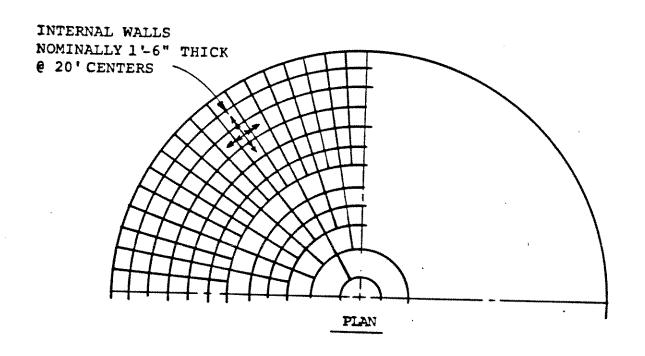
TYPICAL STRUCTURAL ARRANGEMENT OF CONE
